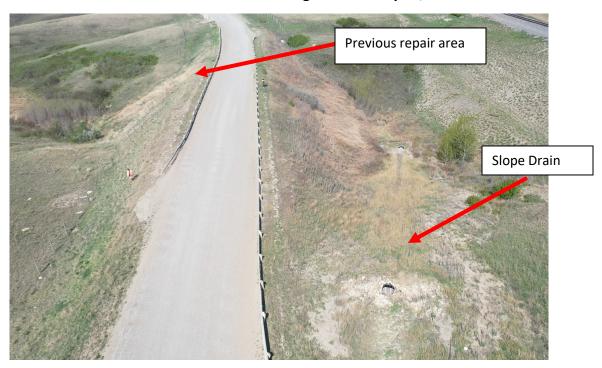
North side of highway – slope drain. Note exposed pipe at two locations. Photo taken facing west on May 12, 2023.
